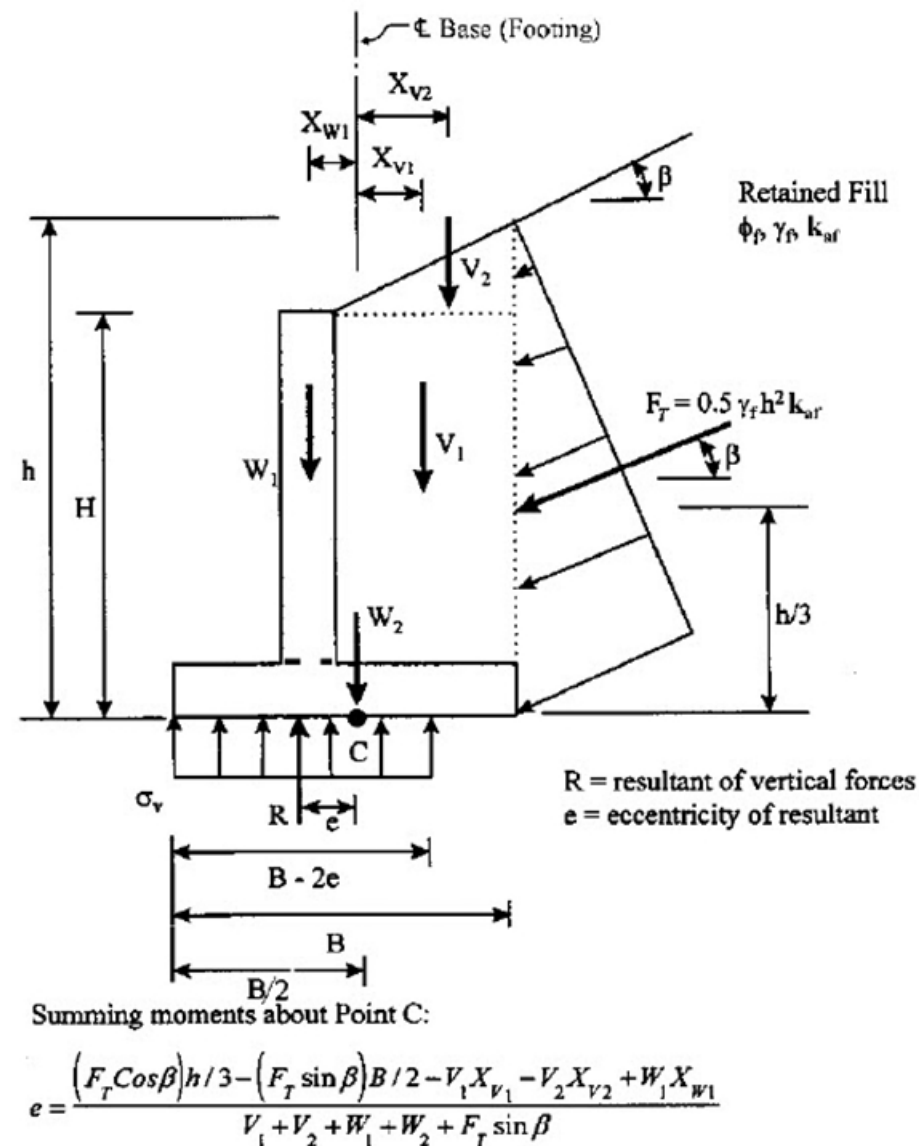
Bearing Stress Criteria for Conventional Wall Foundations on Soil
